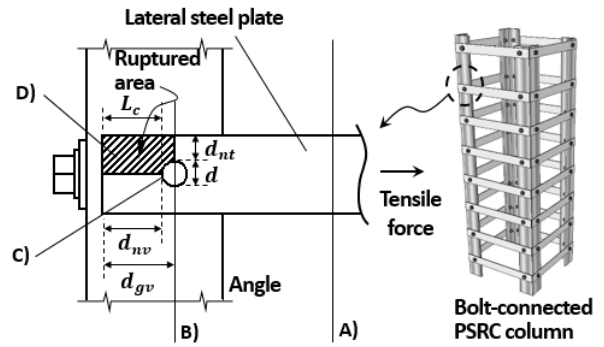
Failure modes of bolt-connection between the steel angles and lateral steel plates : A) Yielding of the gross section, B) Tensile rupture of the effective net section, C) Bearing failure at the bolt-hole, D) Block shear rupture
